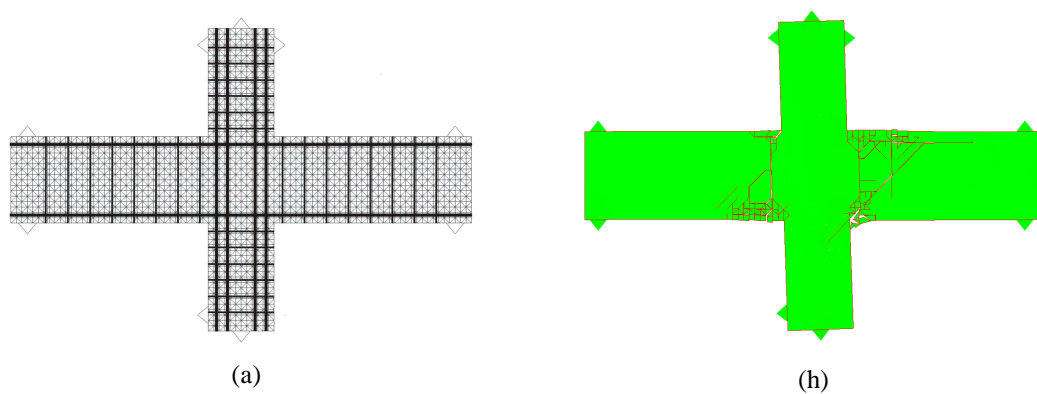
Interior beam-column joint without stirrups: (a) discretization, (b) failure patterns for $H=216.4$ kN.
